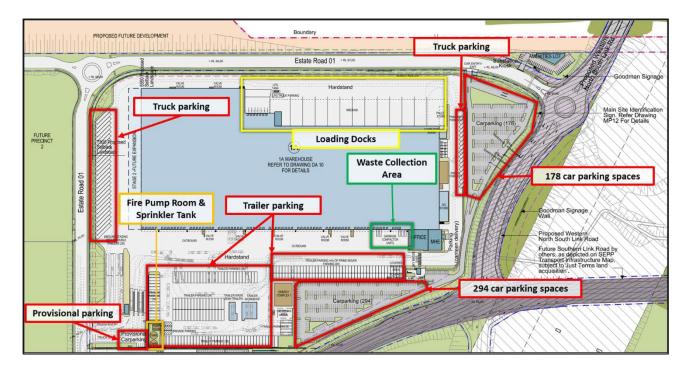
Light and Heavy Vehicle Parking and Loading Areas
